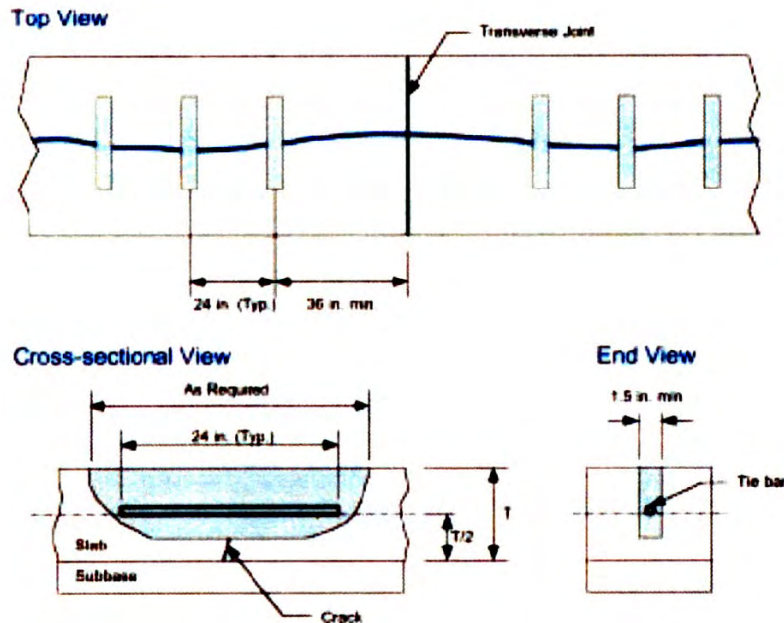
Slot-Stitching of a Concrete Slab Across a Crack
